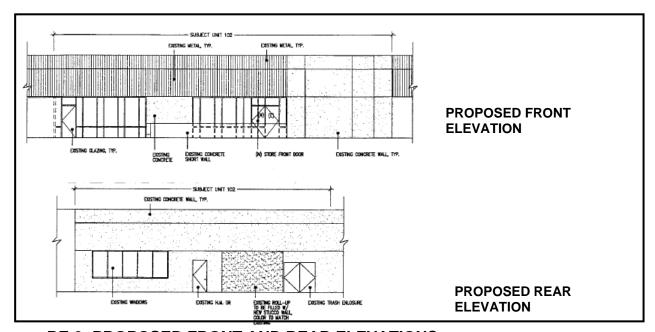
PROPOSED FRONT AND REAR ELEVATIONS
